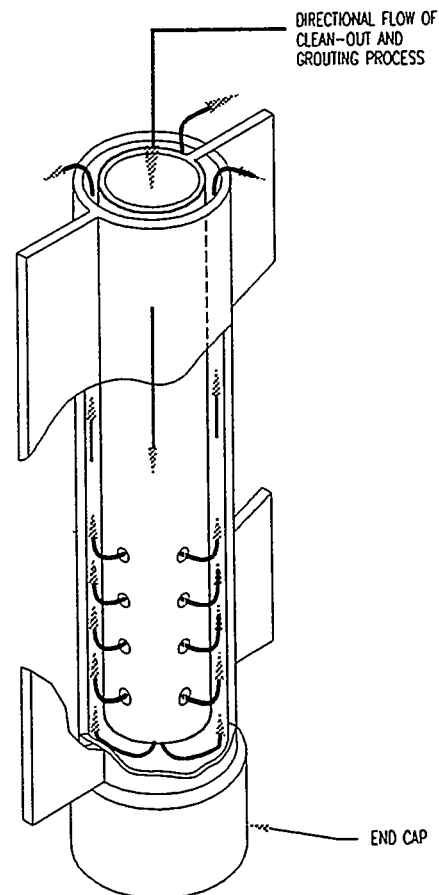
CLEAN-OUT AND GROUTING OPERATION
